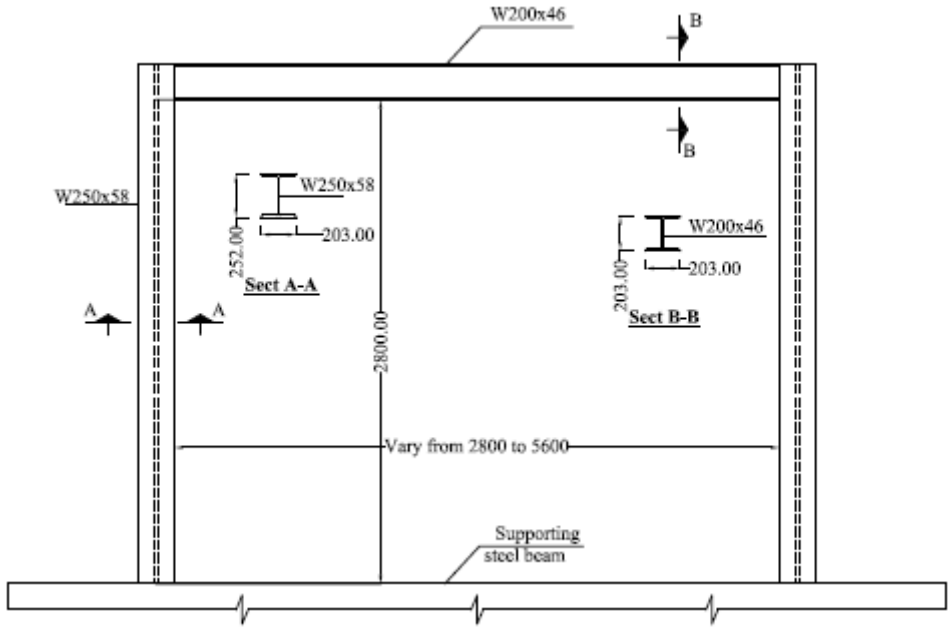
Geometry and details of the master steel frame used in the FE investigation
